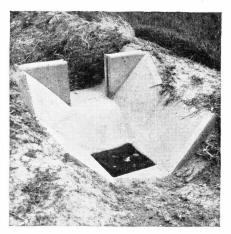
Small concrete drop structures are used to prevent erosion in ditches where the slope is not too steep.
